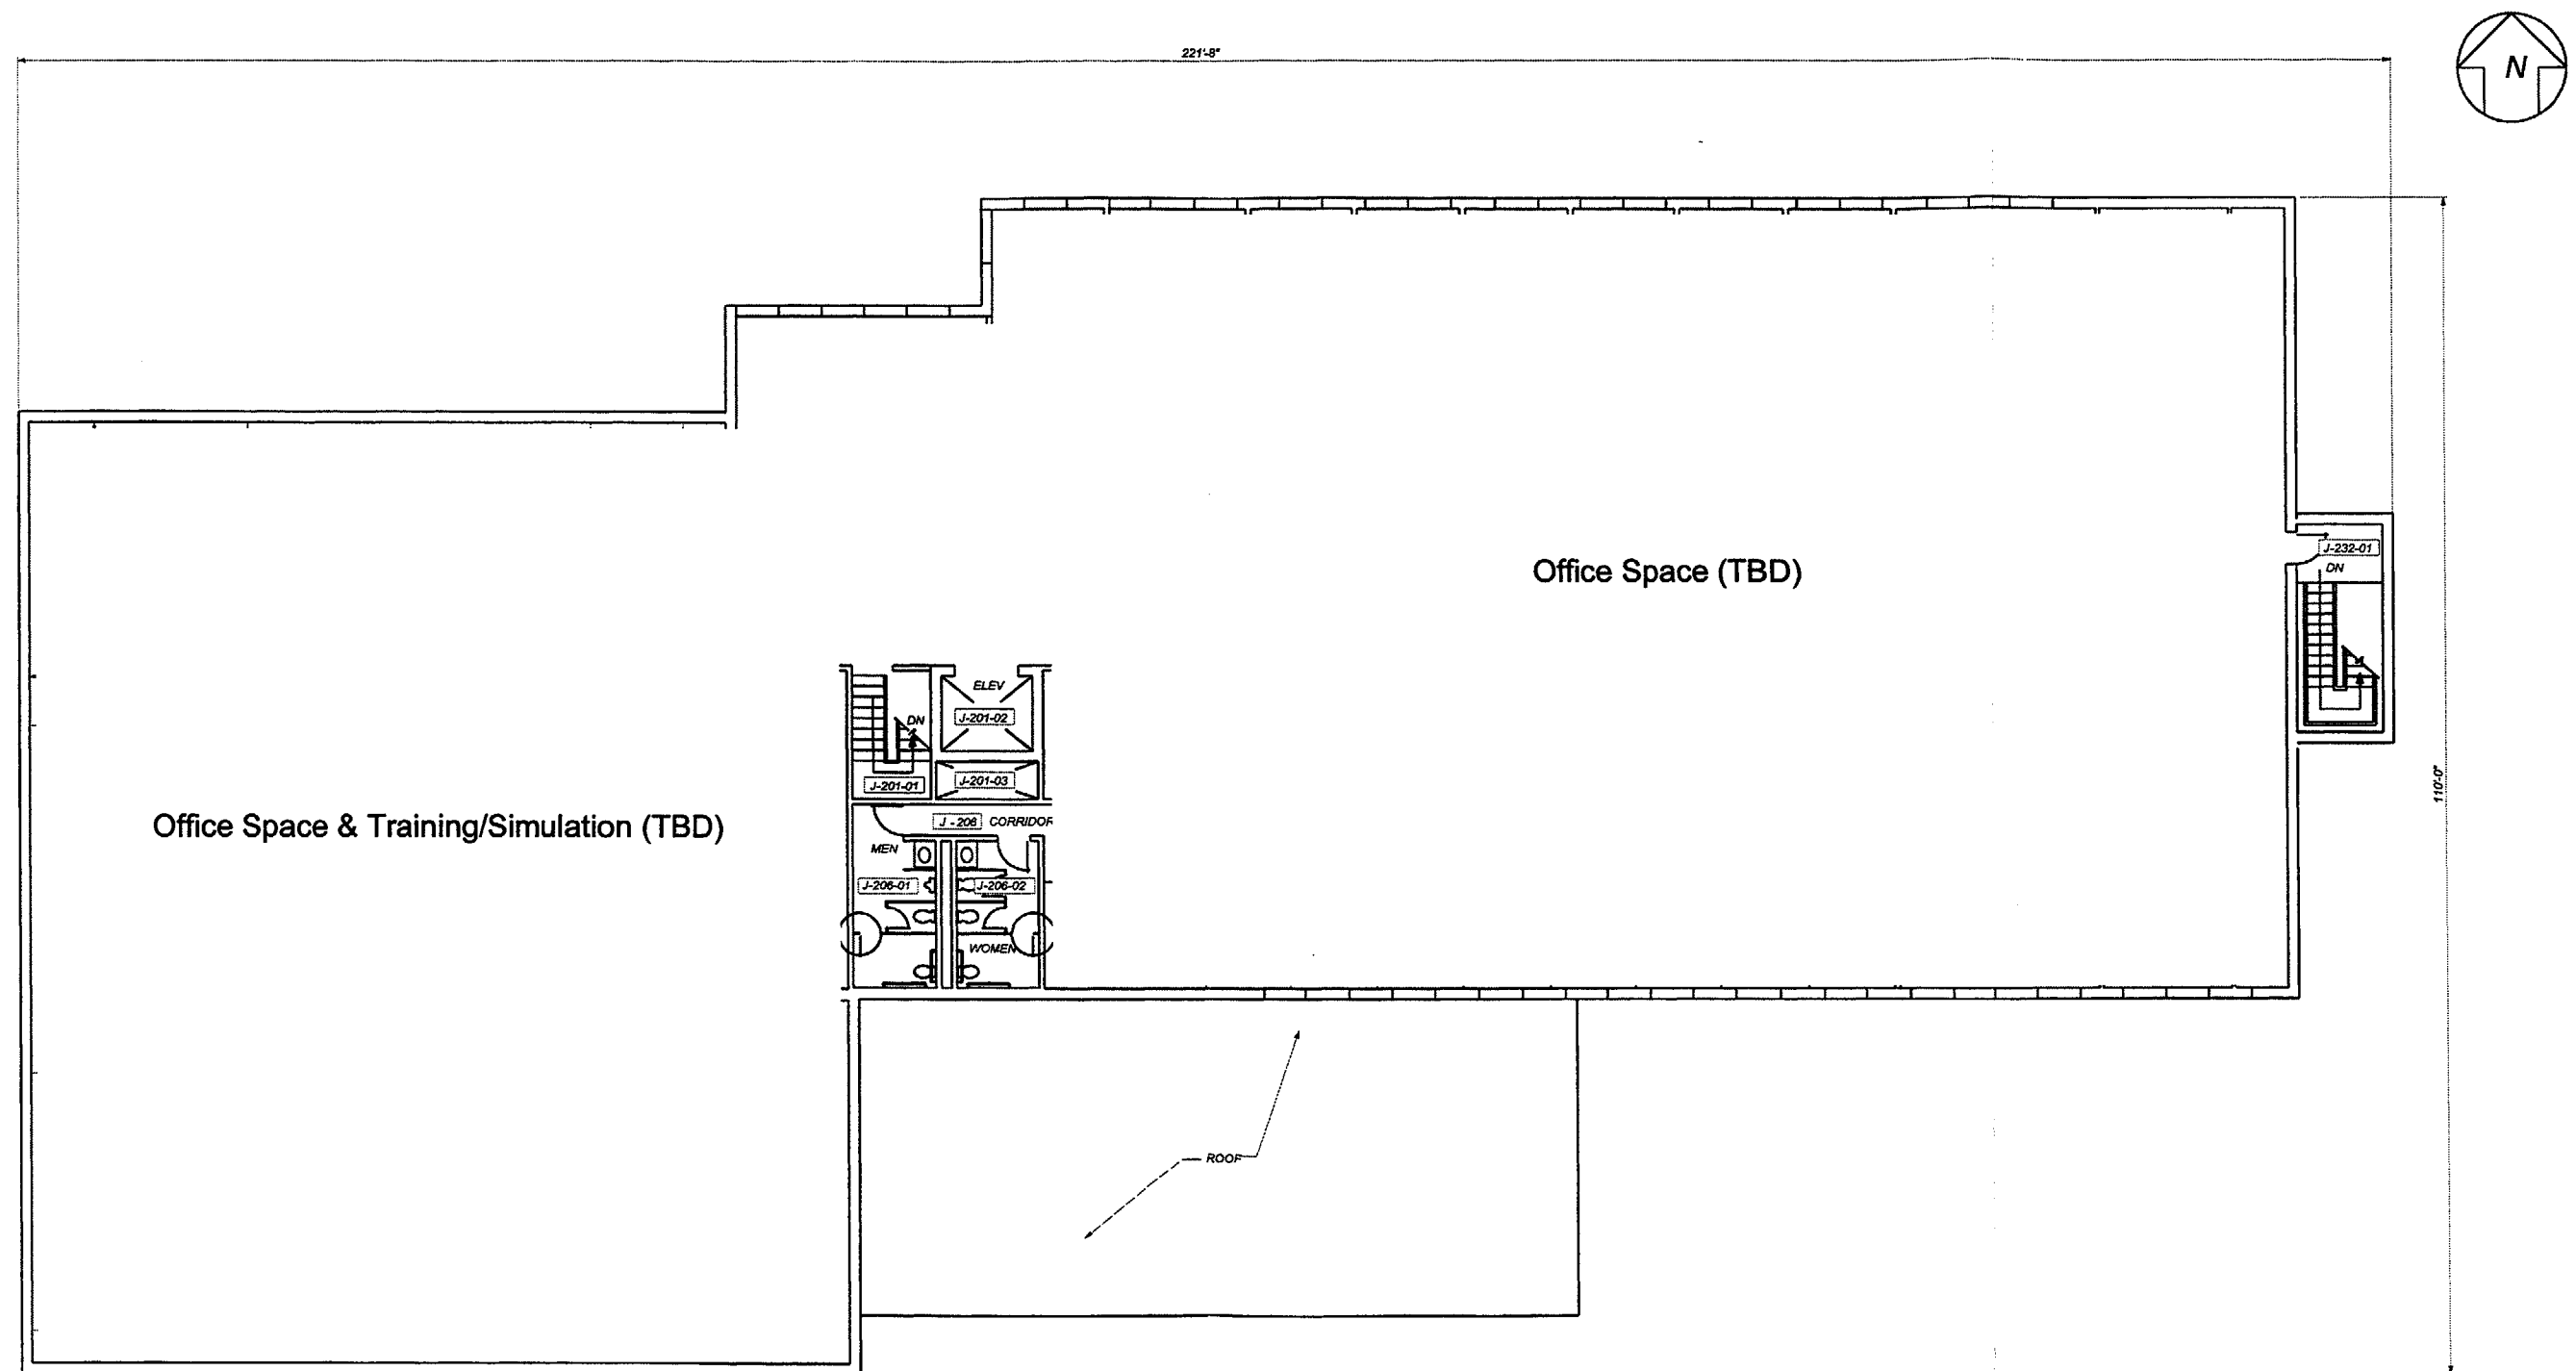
General Arrangement - Administration Building (BAD) - Conceptual Layout - Second Floor
